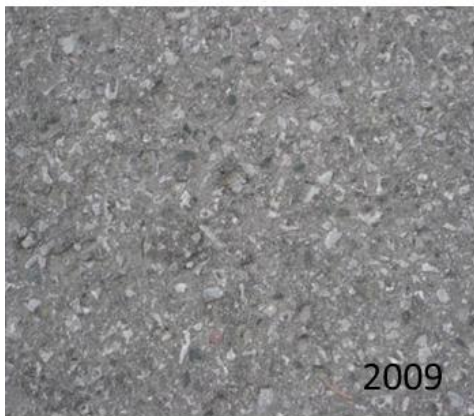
Ida Street Pavement Surface Characteristics [UL-Islam 2010]
